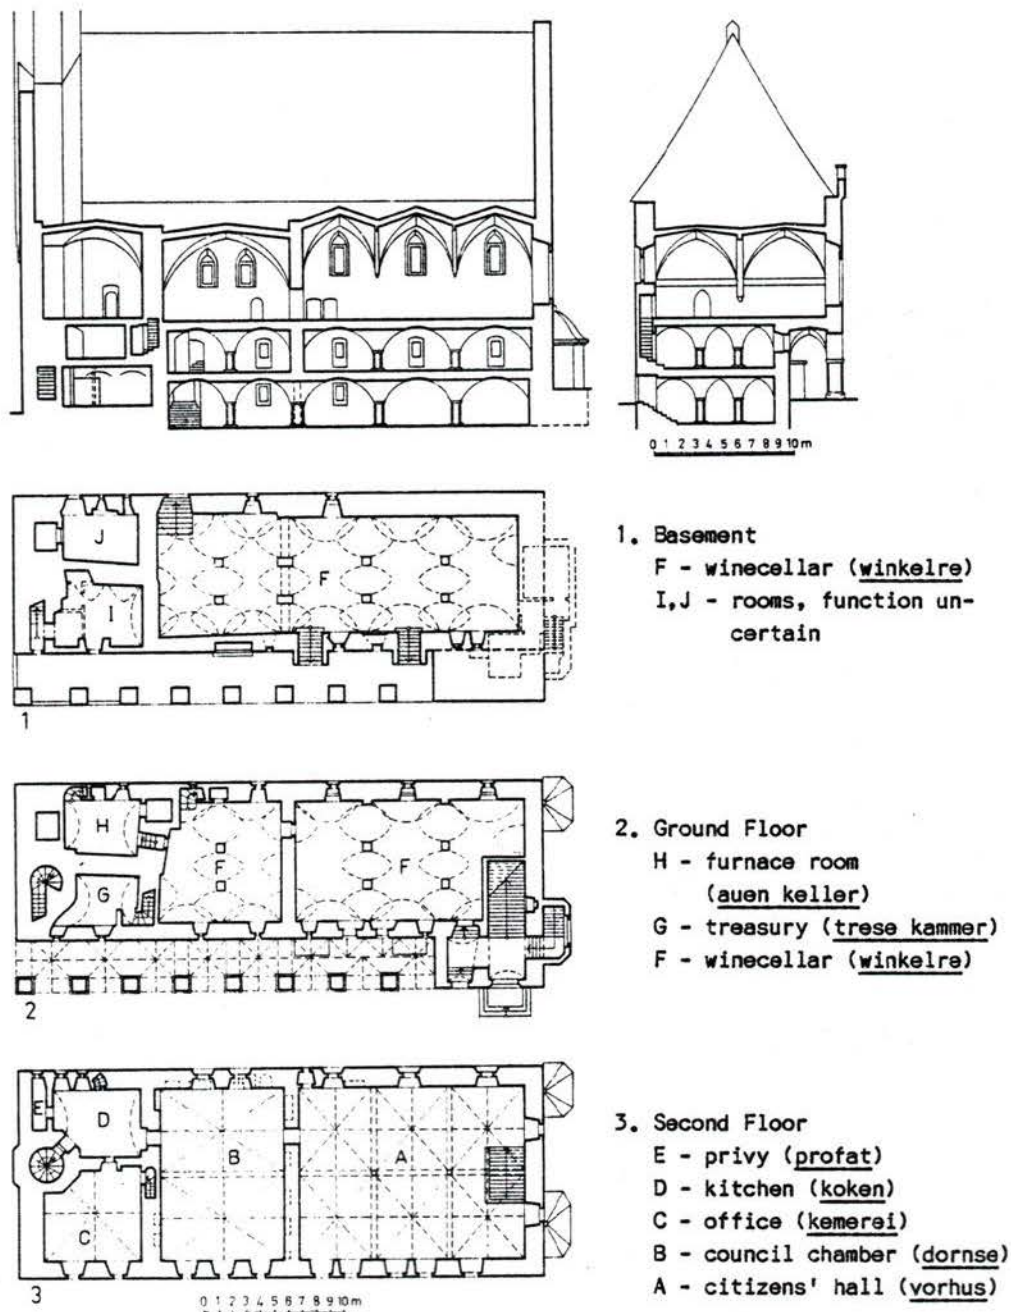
Raekoda (Town Hall), Tallinn. Cross-sections and floor plans.
